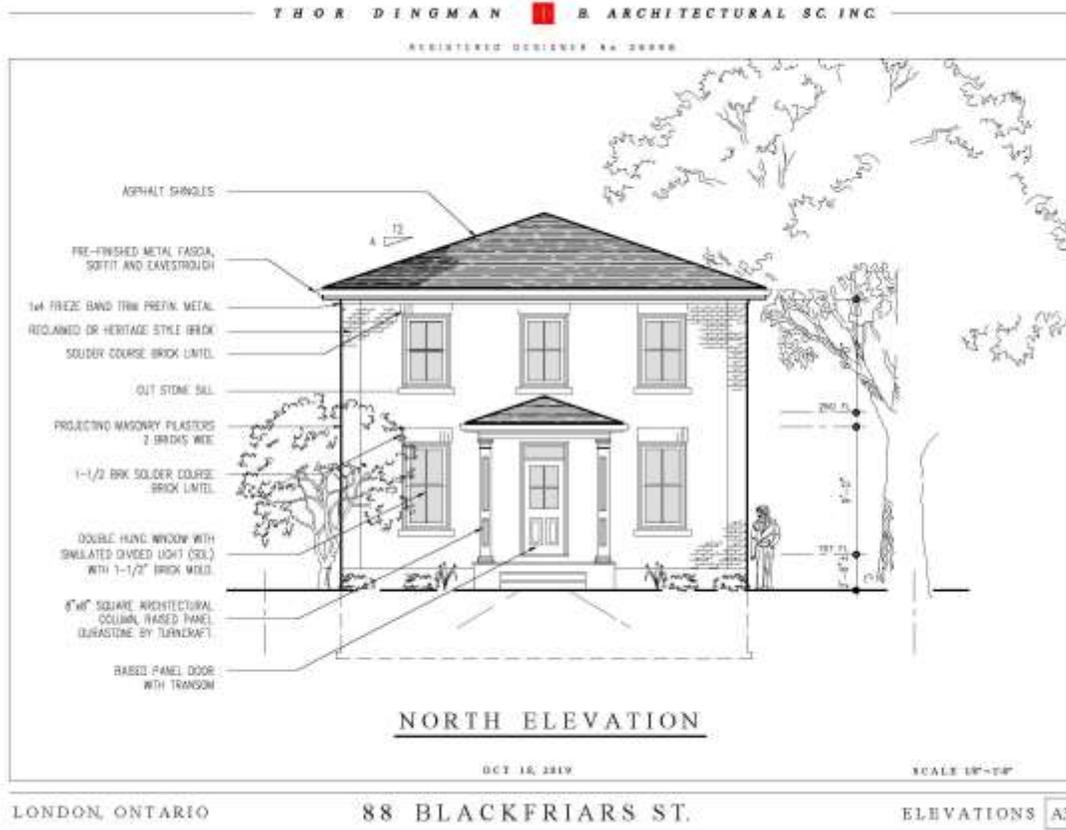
Front elevation of the proposed building at 88 Blackfriars Street.
